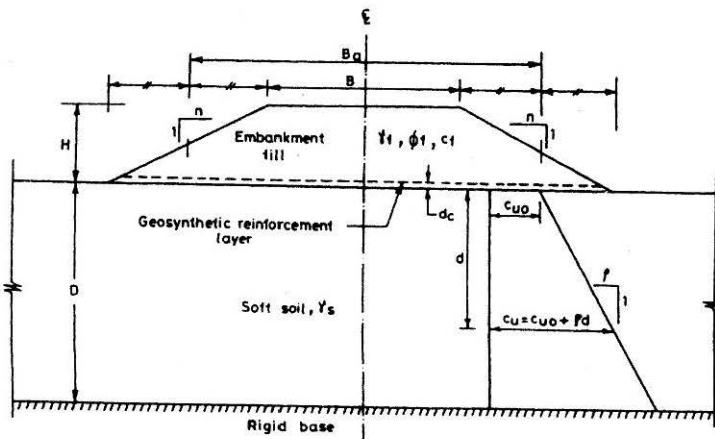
Design parameters of Reinforced Embankment – Foundation System.
